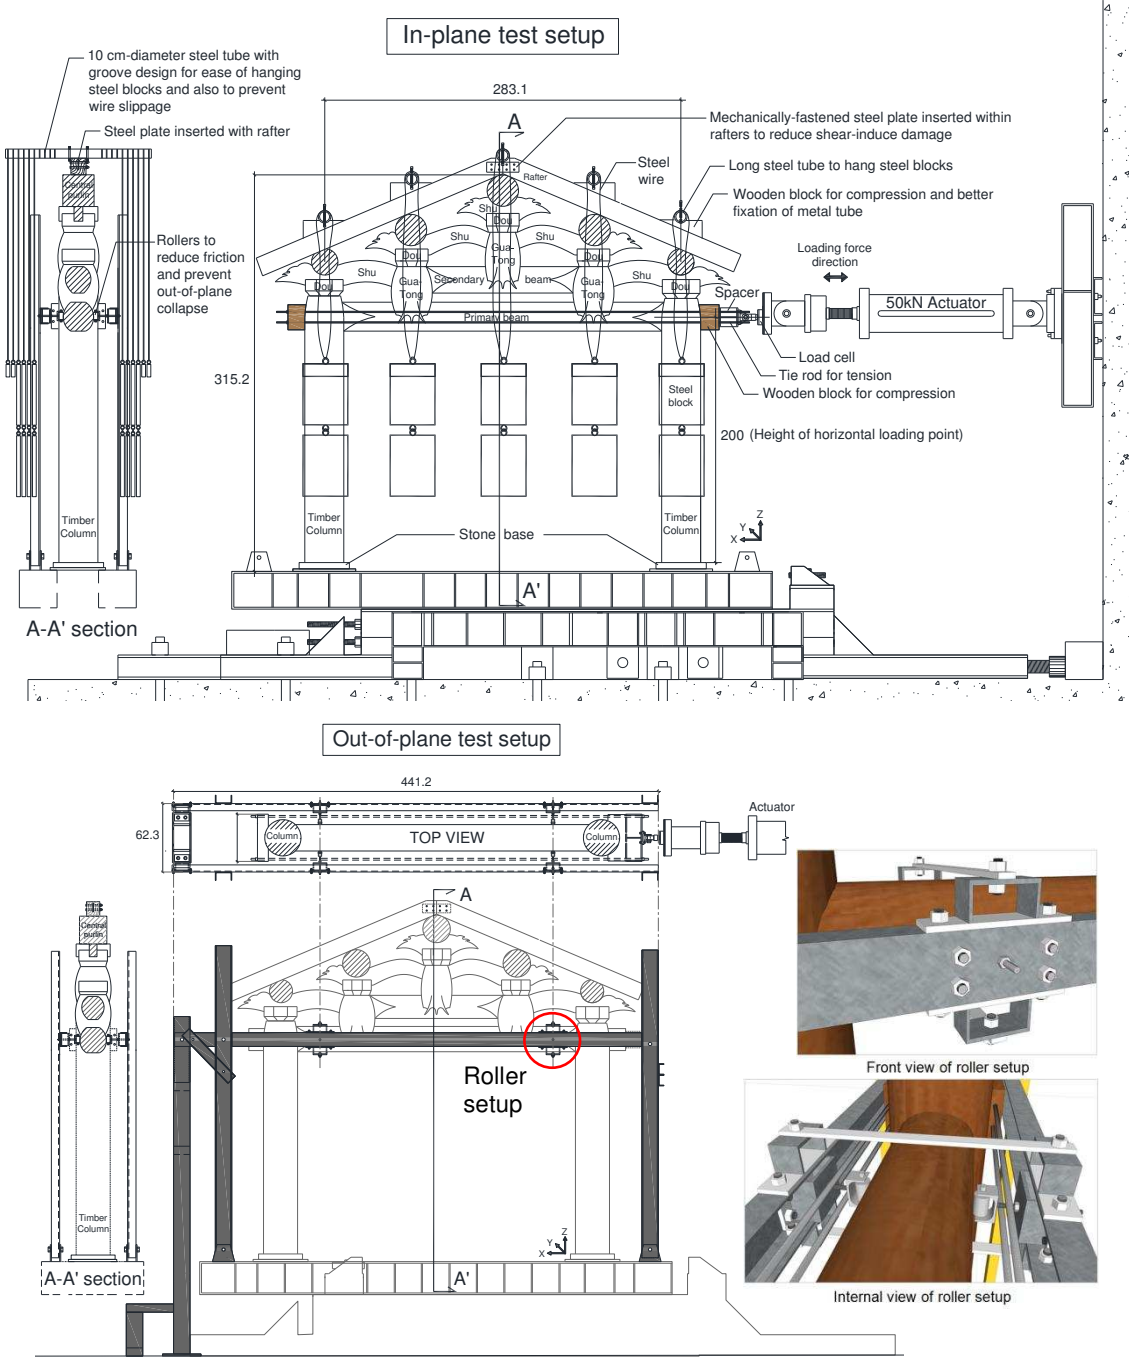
Test setup for Specimen 3 (Measurements in centimeters)
